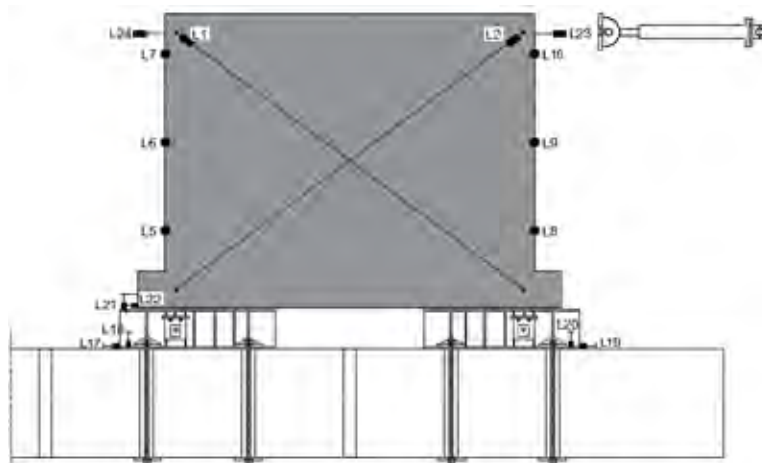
Testing setup for in-plane testing of retrofitted specimens
